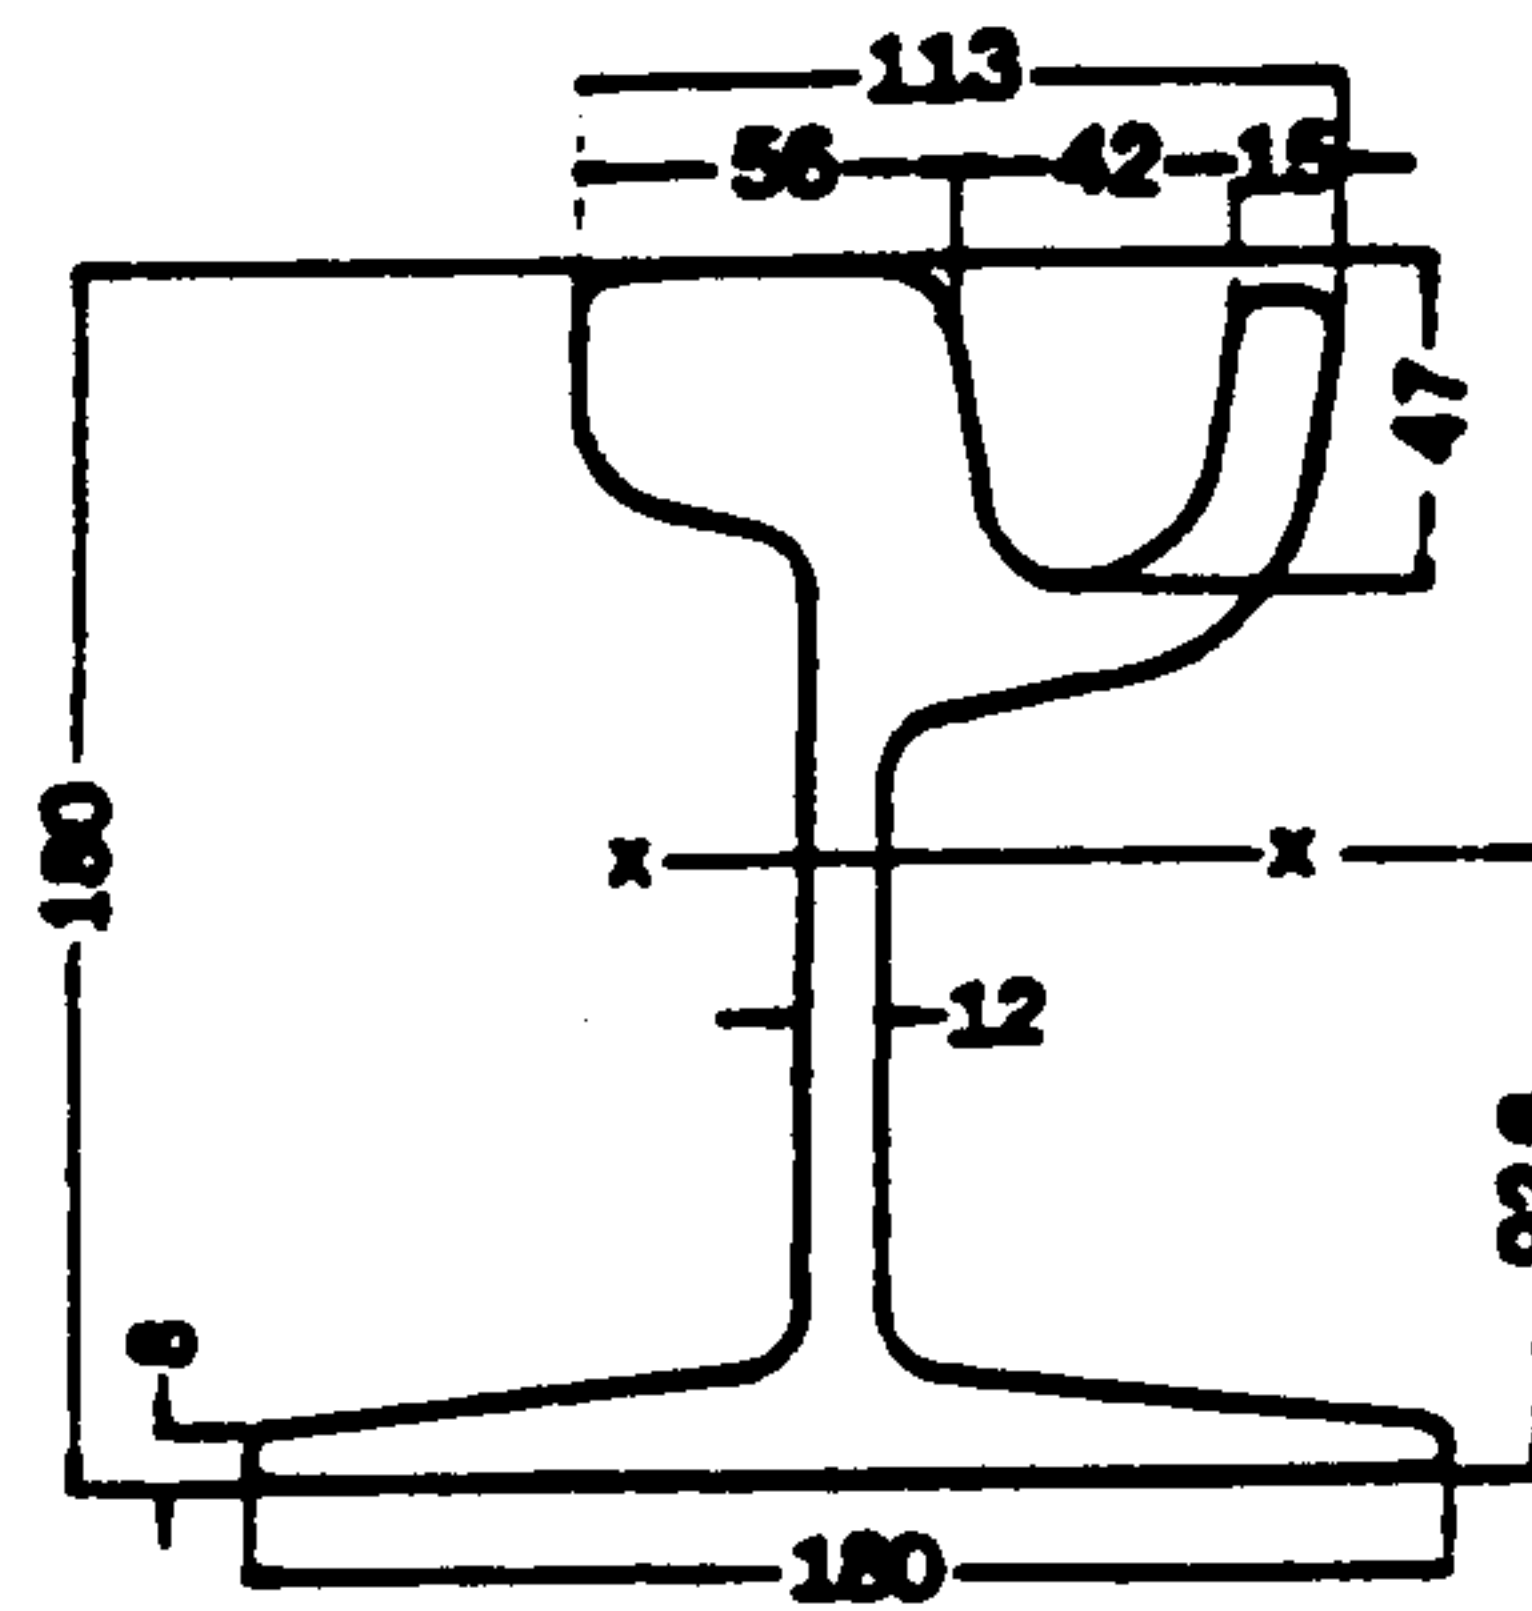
High profile rail, Ri59 rail used for Manchester Metrolink.
